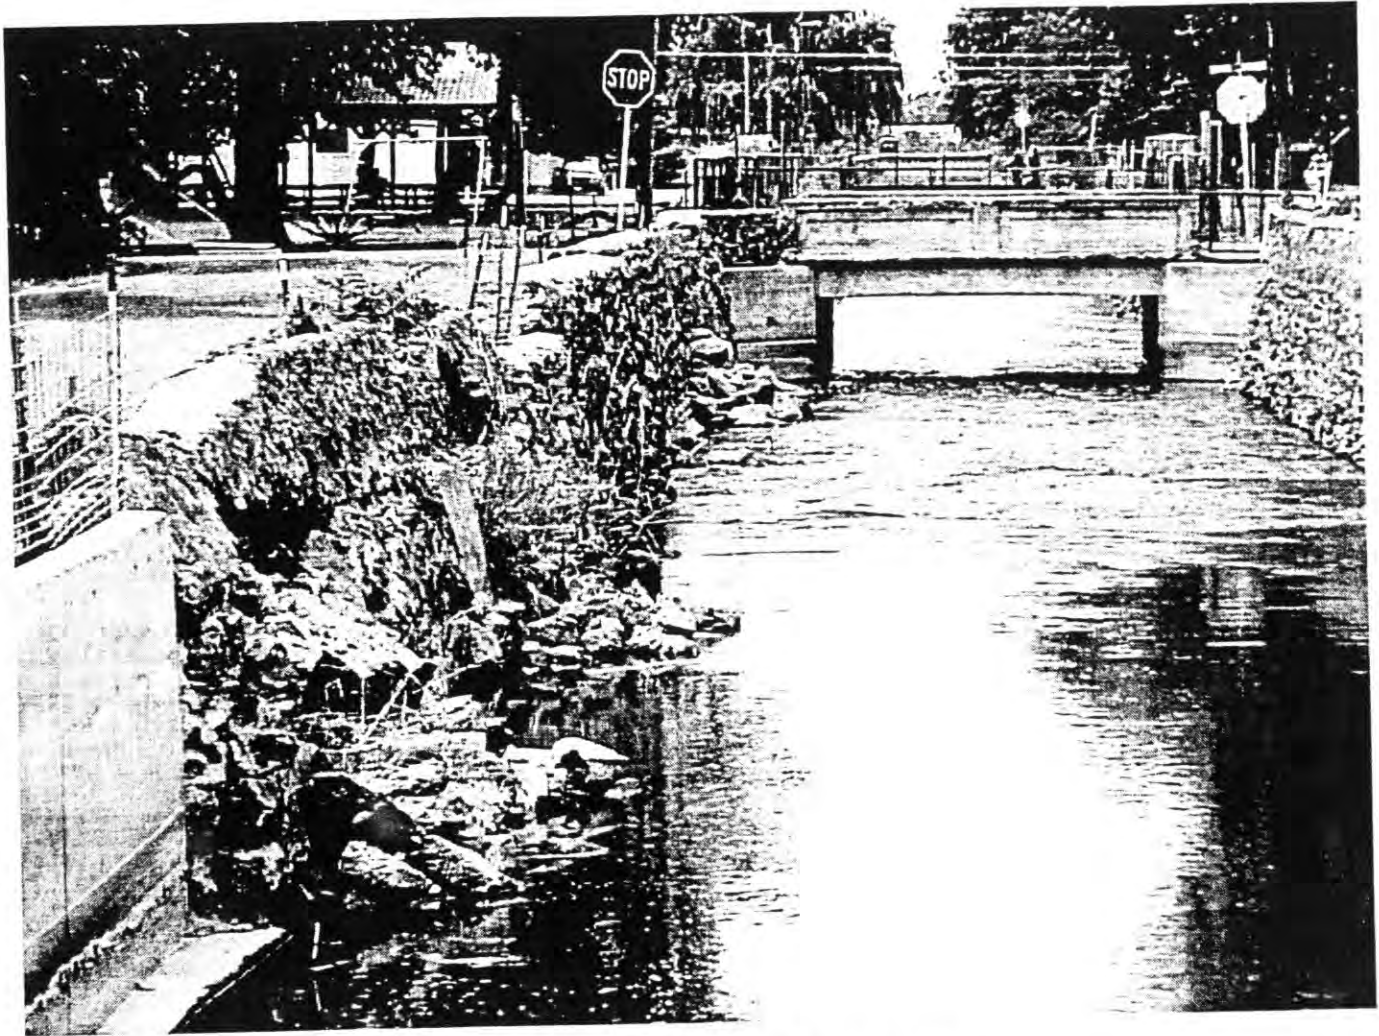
Damaged section of wall between Main Street and Idaho Street.
